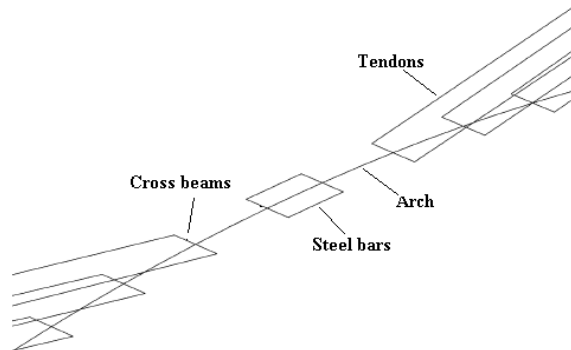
Figure showing how the auxiliary cross beams are used to connect the tendons and the steel bars to the arch.
